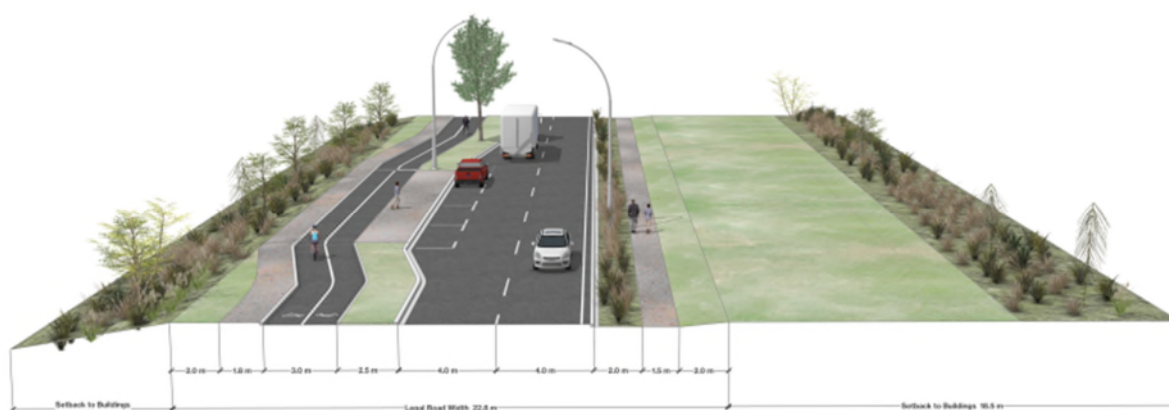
a: Indicative Typical Cross-Section for the East-West Road (Local Road, to be upgraded to Arterial)
